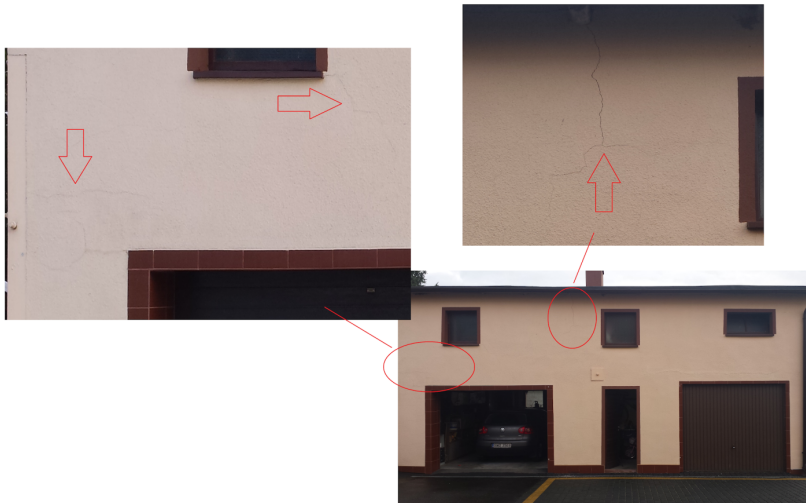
Cracks on the western wall of the building # 2 (source: own study)
